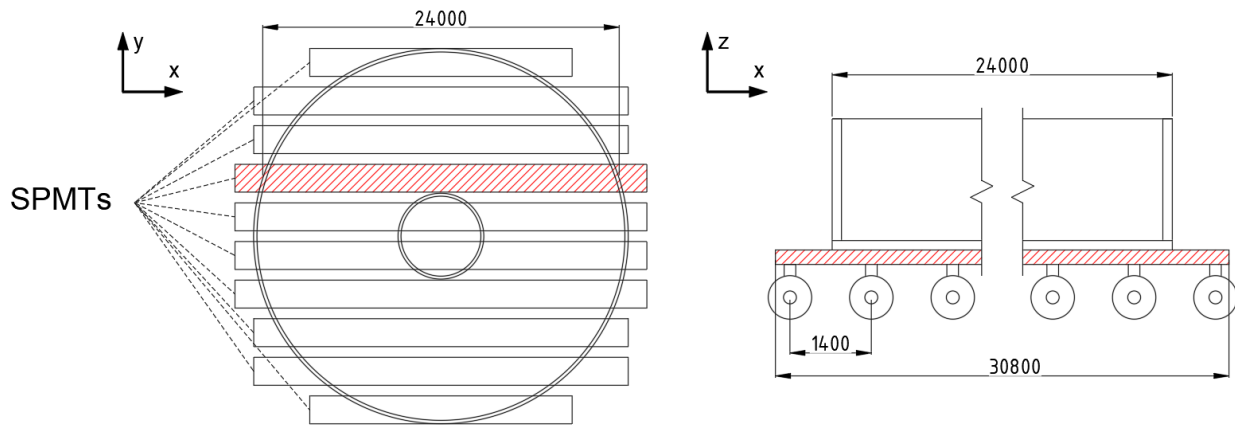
SPMT setup and dimensions for 2D deflection example
